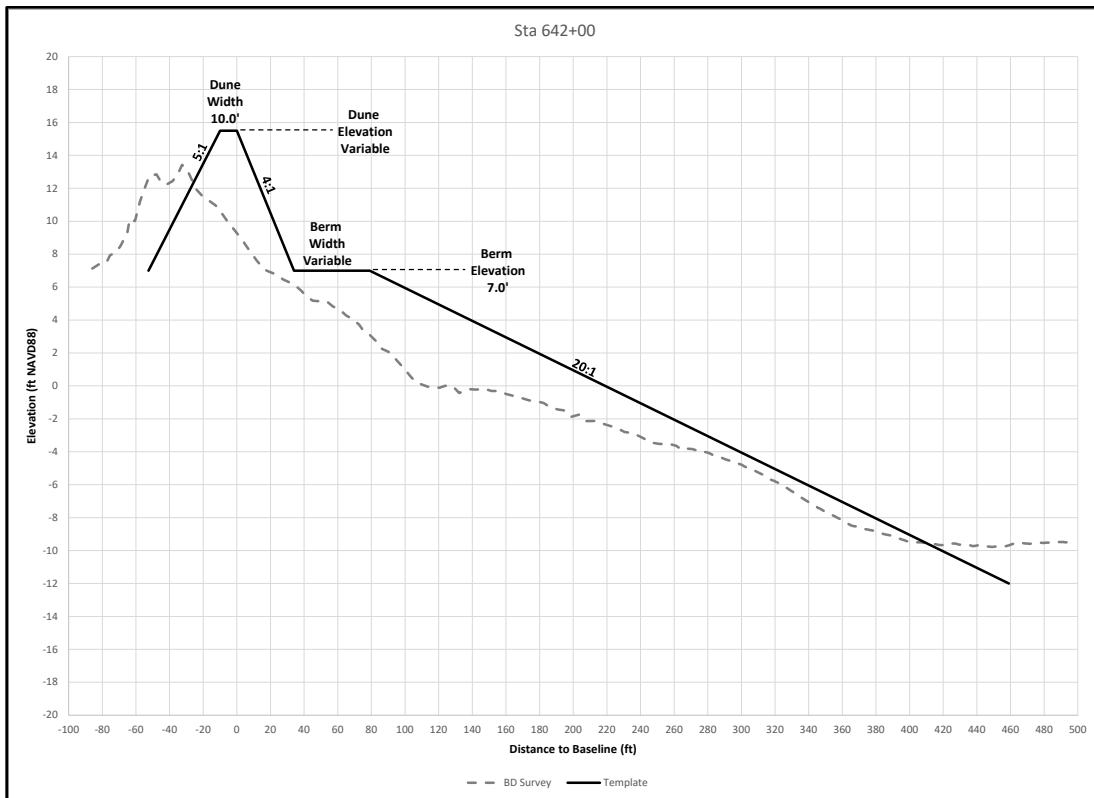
Beach Fill Typical Cross Section – With Berm
